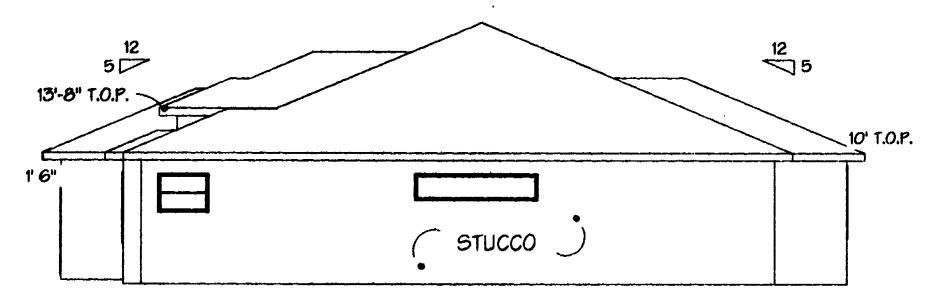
EXHIBIT B ORIGINAL PLANS FOR HOME ON FOLLOWING PAGE(S)
